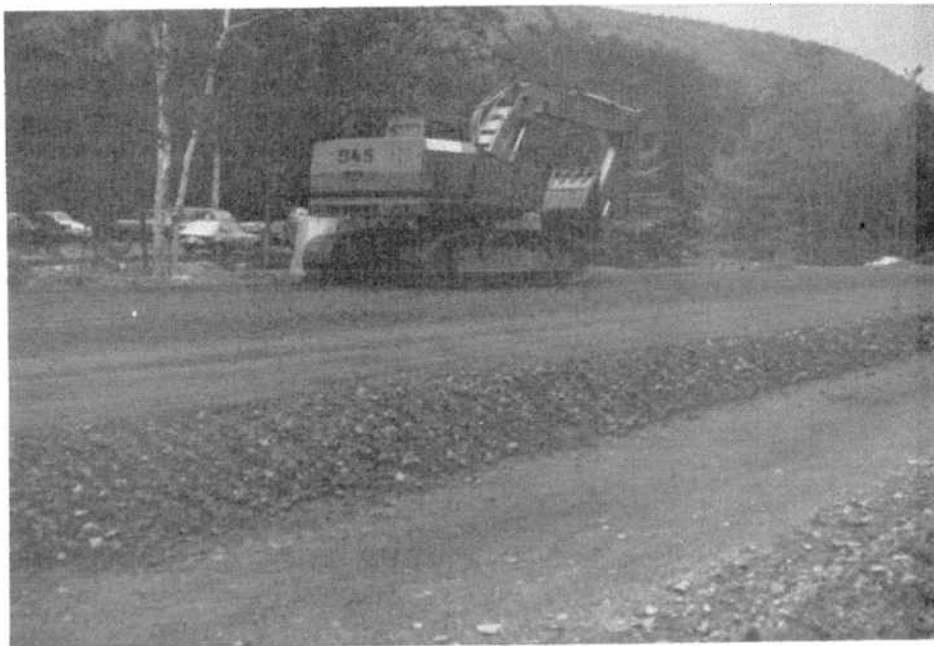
Completed Reclaimed Stabilized Base Prior to Fine Grading and Placement of Hot Bituminous Pavement
